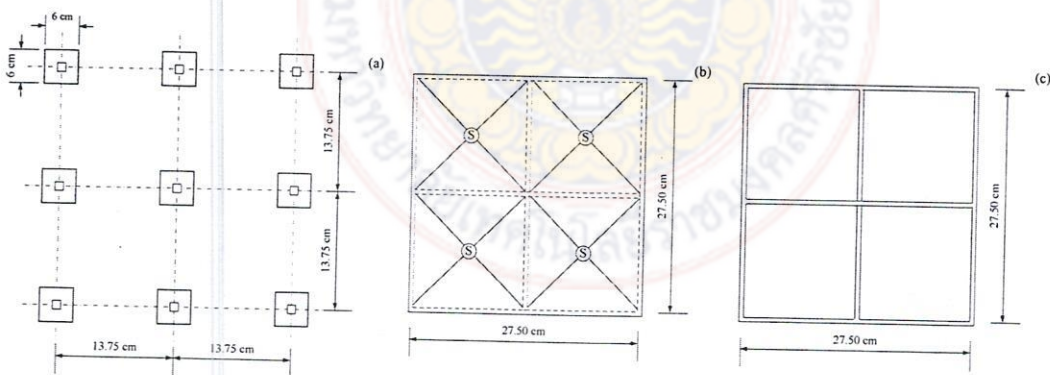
Foundation plan (a) floor plan (first floor for one-storey house; first and second floors for two-storey house) (b) roof beam plan (c) floor beam plan
